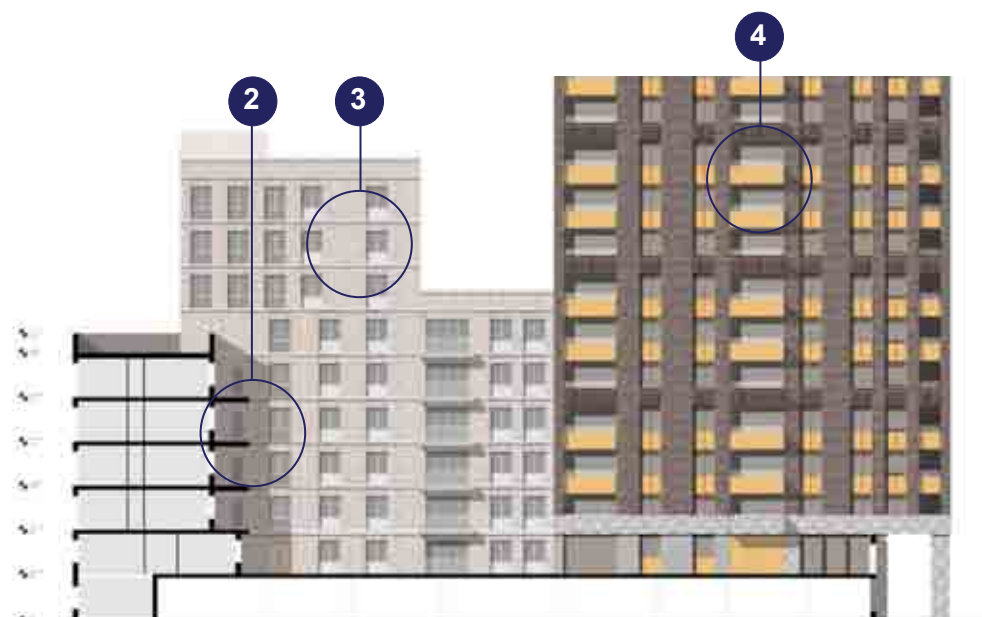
Block 4 North Elevation Planning Submission October 2014
